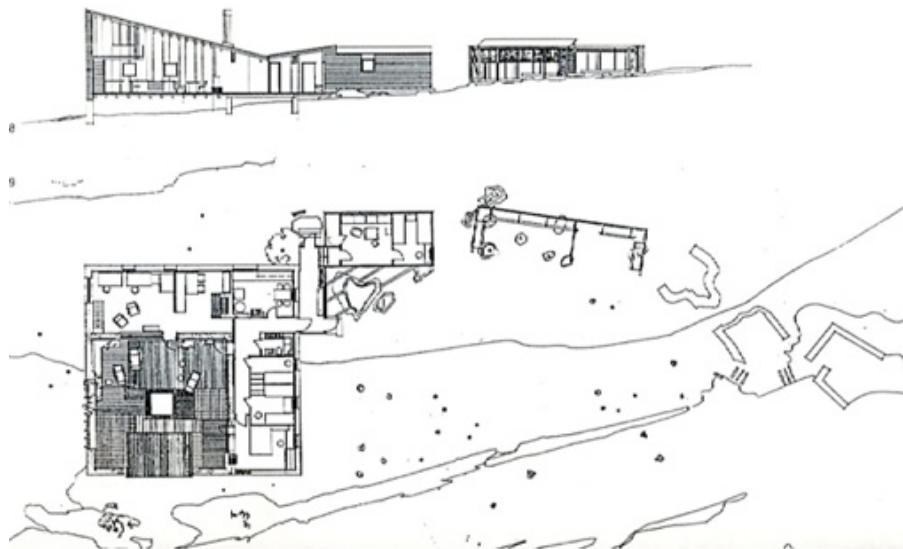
AALTO Muuratsalo House; section; floor plan
